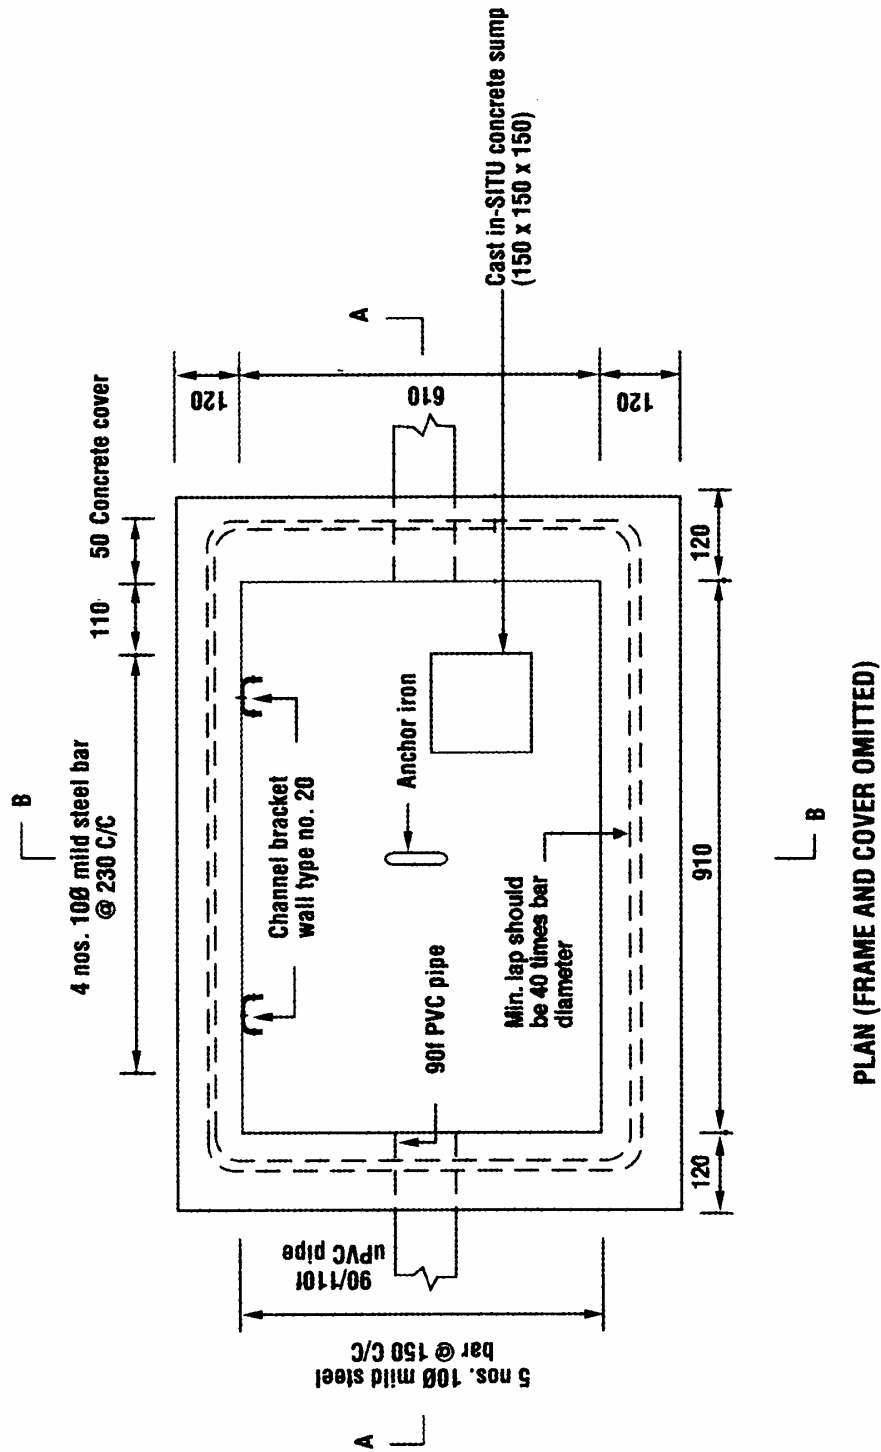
MANHOLE DRAWINGS - TYPE JX2
